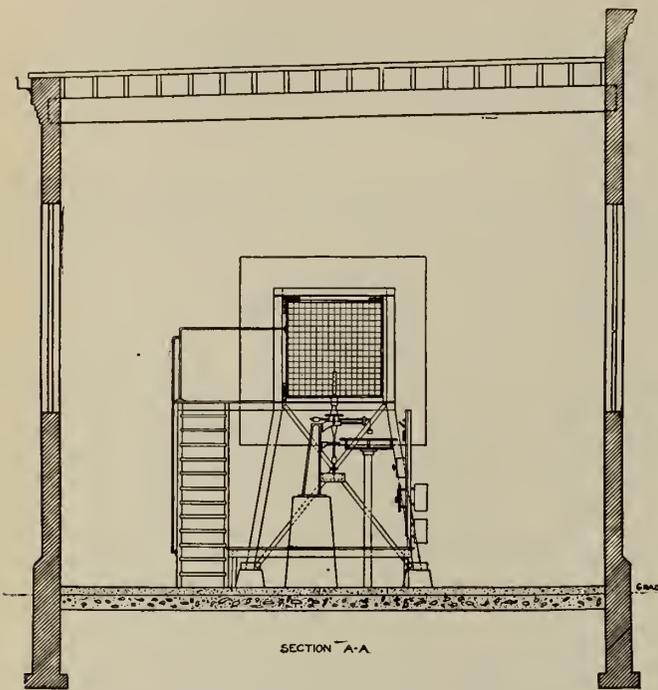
Cross-section of New Laboratory and Wind Channel.
